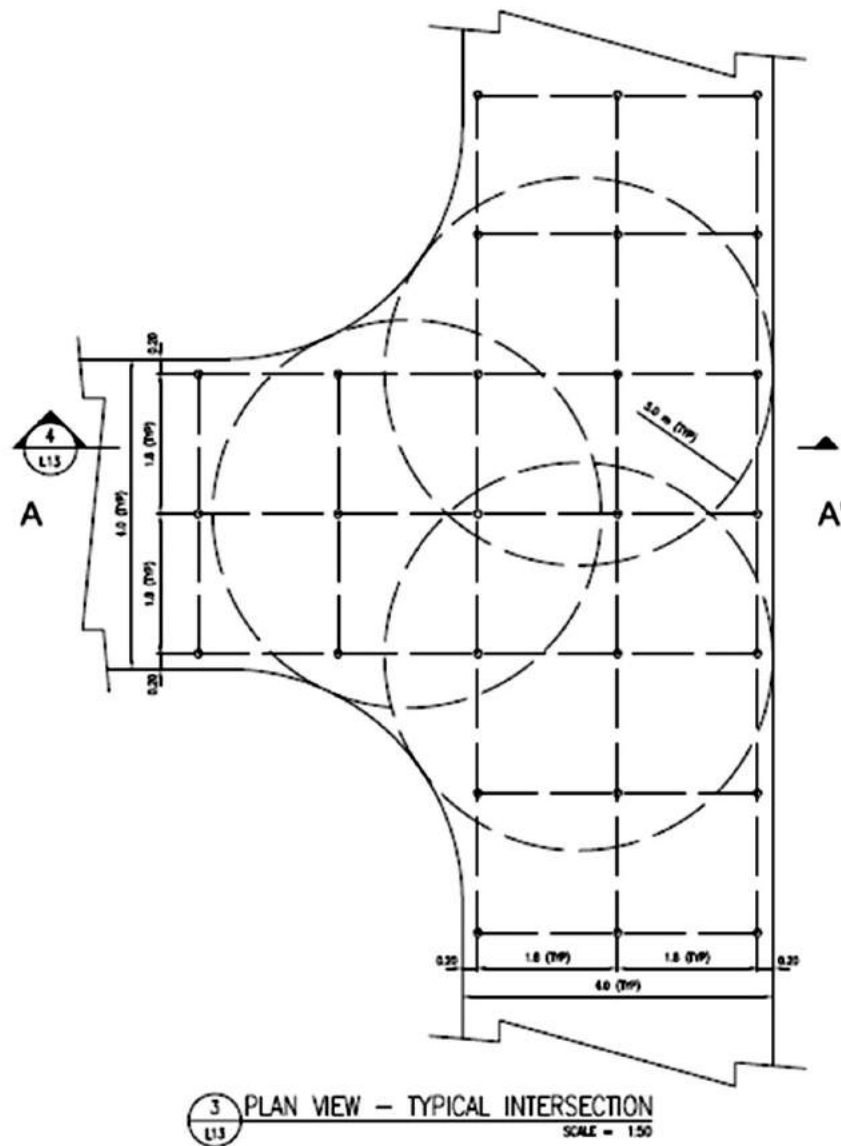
Plan of Cable Bolting Pattern in Intersections
